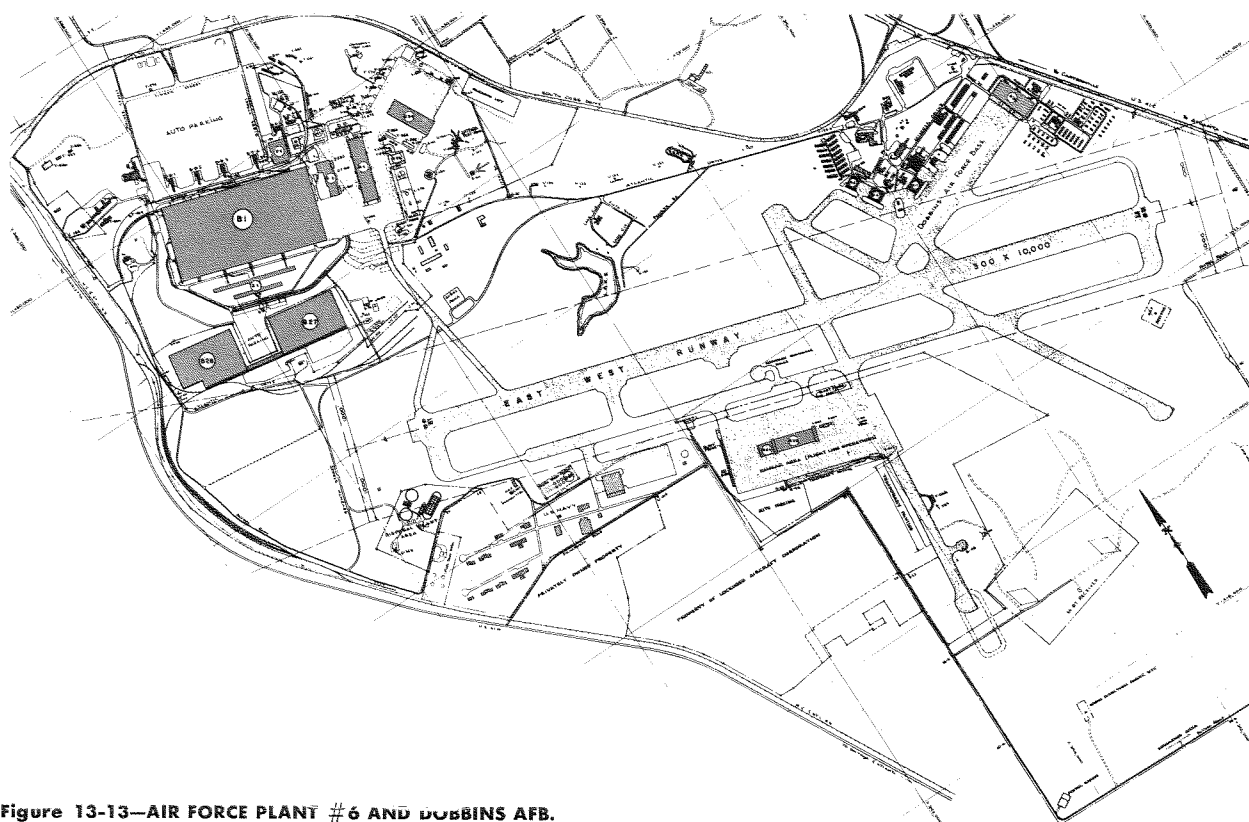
AIR FORCE PLANT #6 AND DOBBINS AFB.
